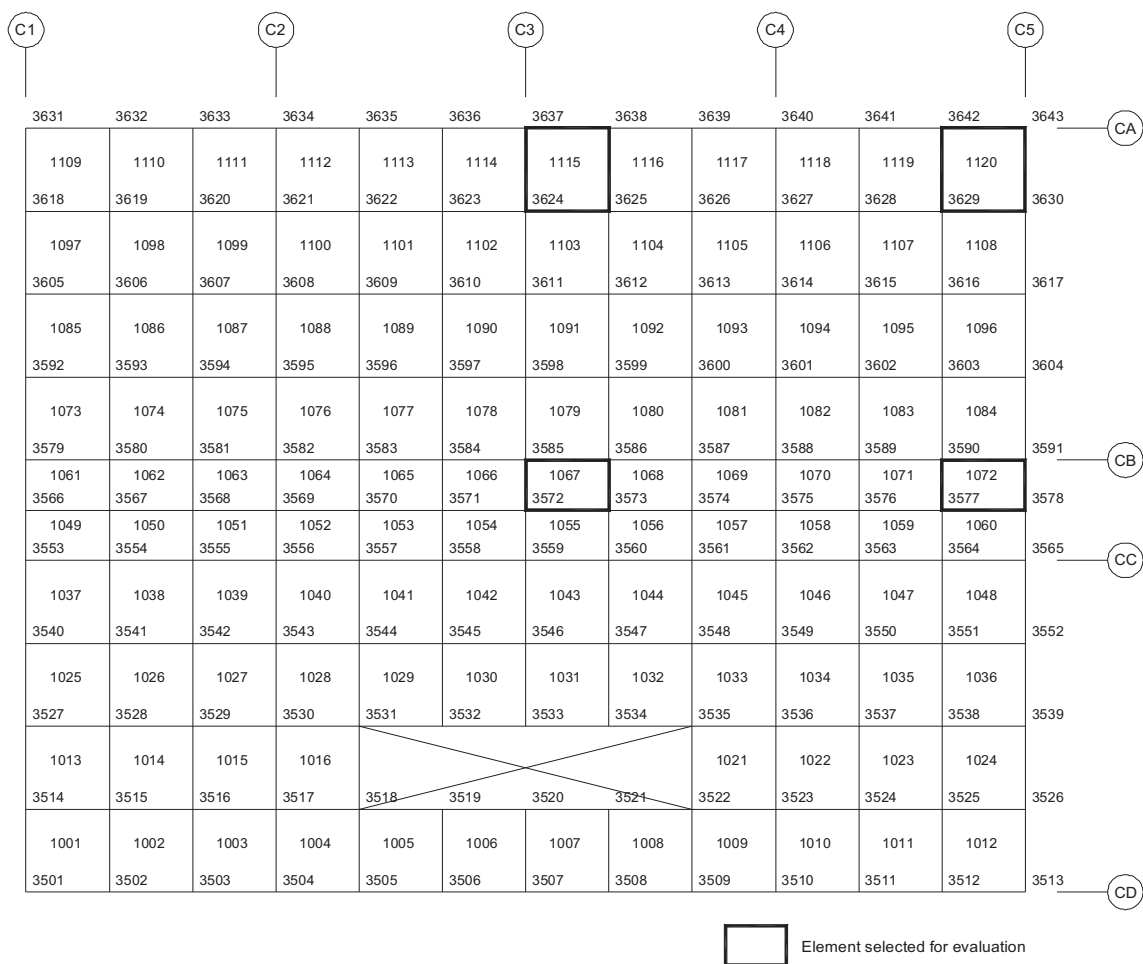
G.2-7. Finite Element Model of CB (External Wall: East Side)
